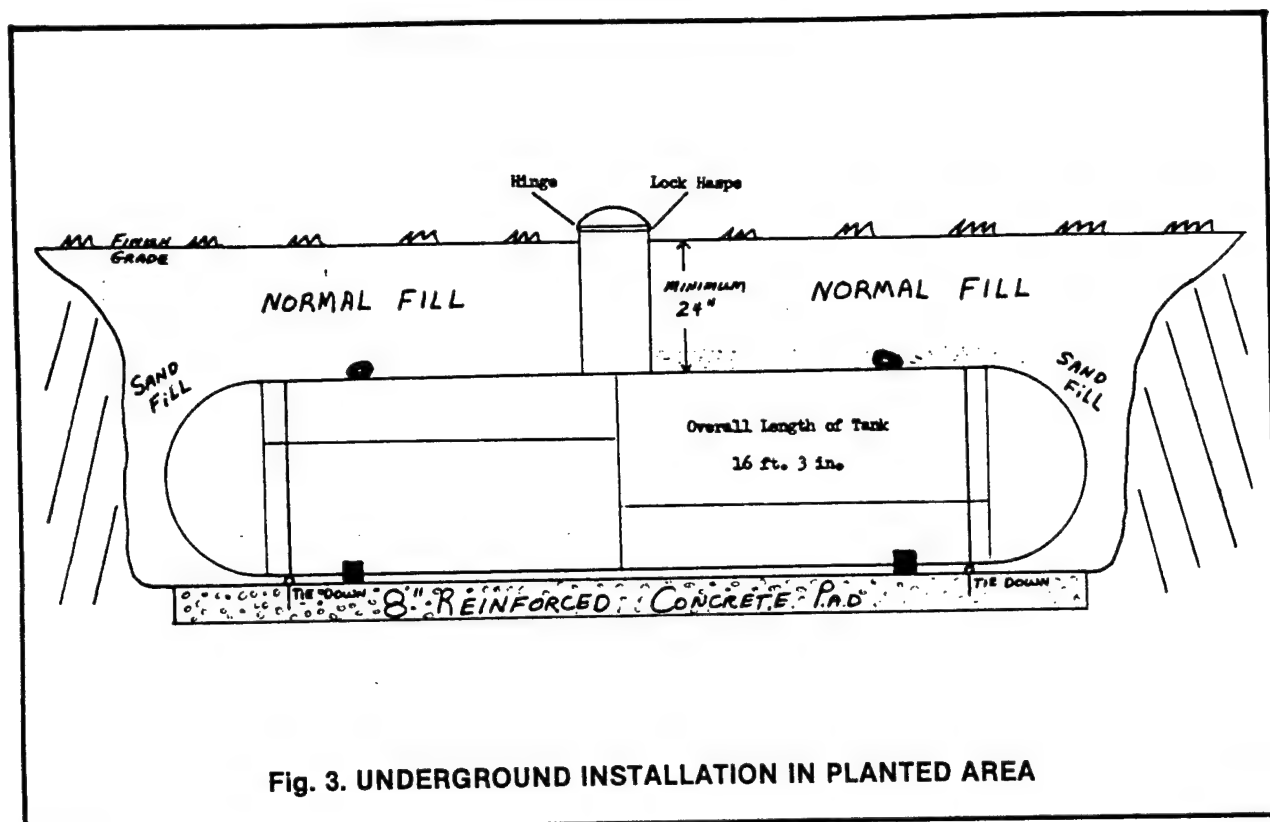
UNDERGROUND INSTALLATION IN PLANTED AREA
